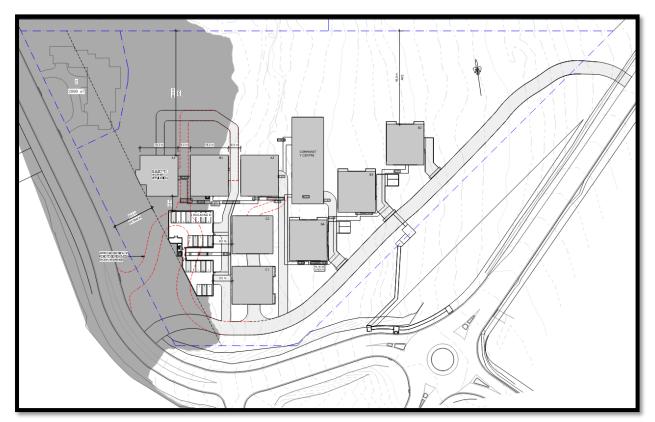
Overall Site Plan (Source: Vigor Master Architectural Layout)
